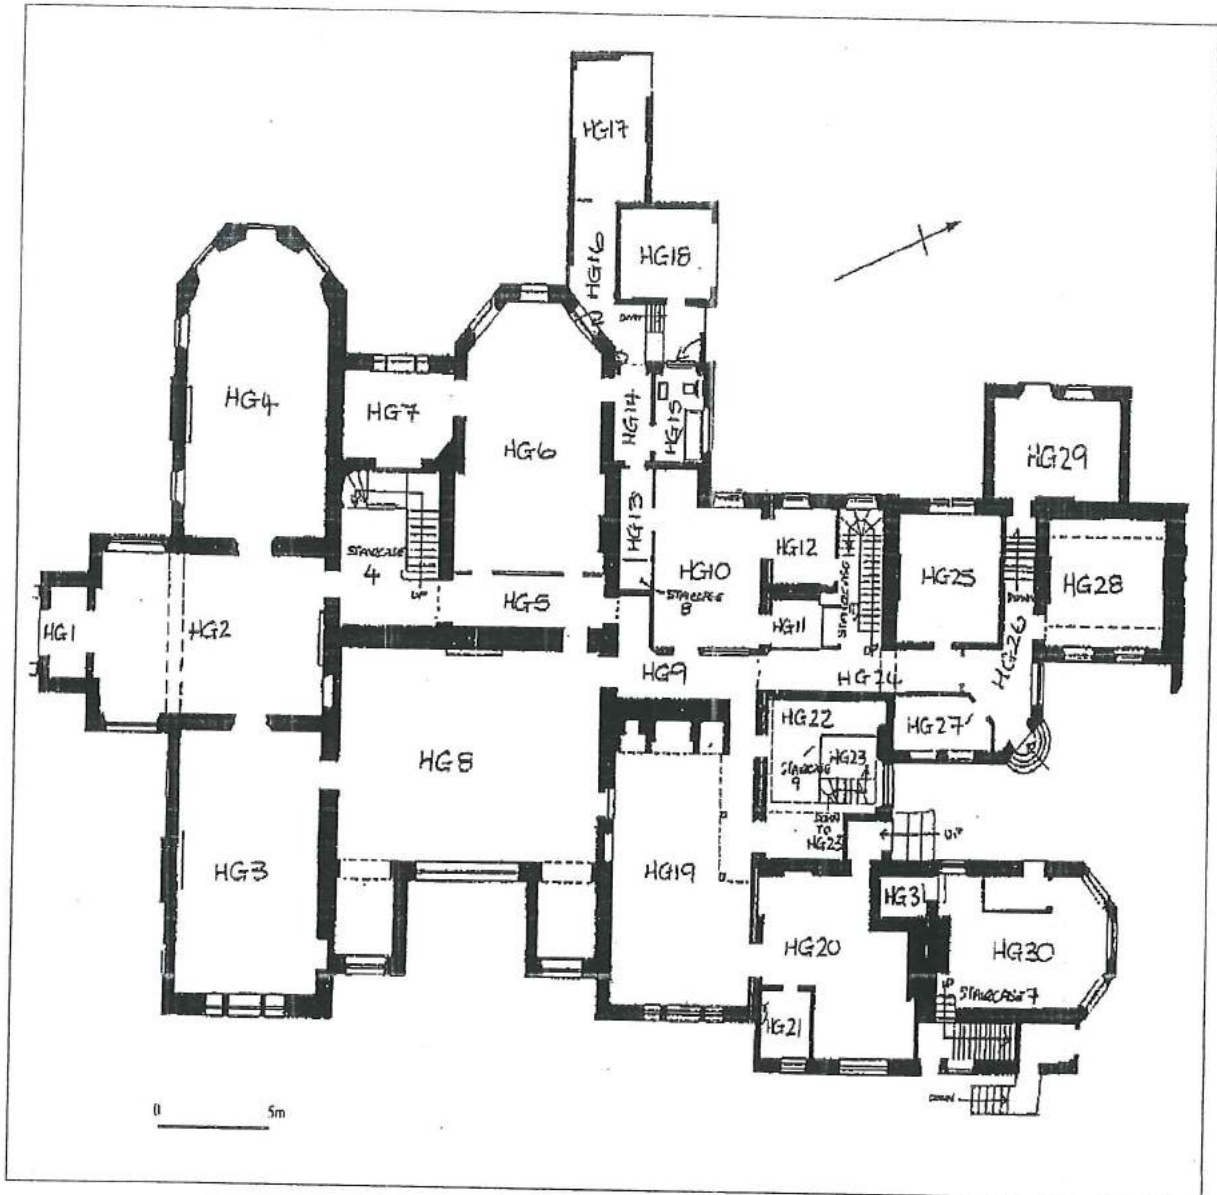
Ground Floor Plan of Winstanley Hall, Wigan.
